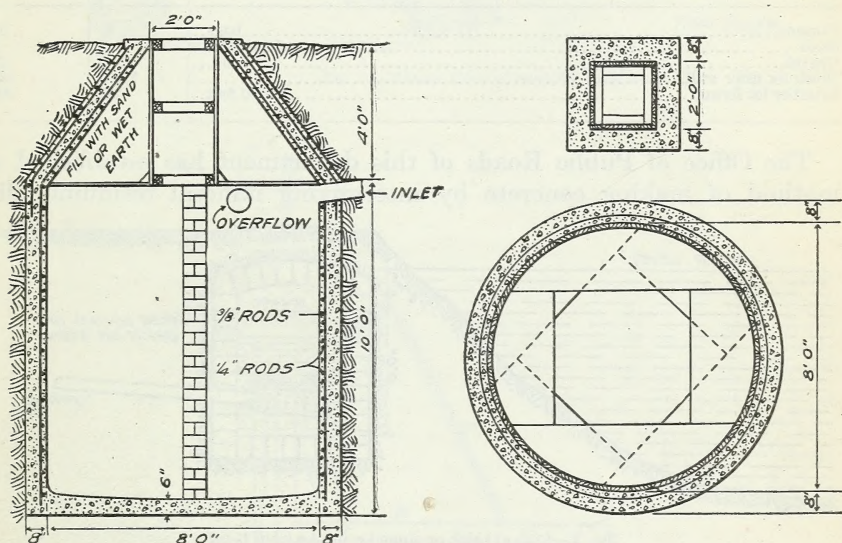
Reinforced concrete cistern, showing arrangement of forms and reinforcing.
